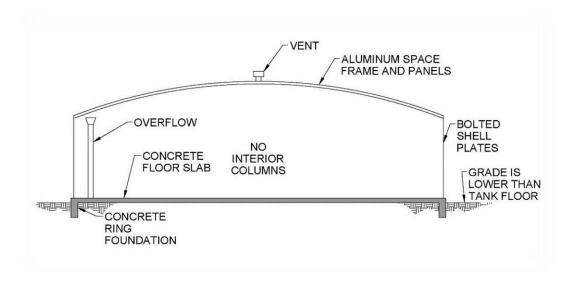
Bolted Steel Tank with Aluminum Dome Roof
